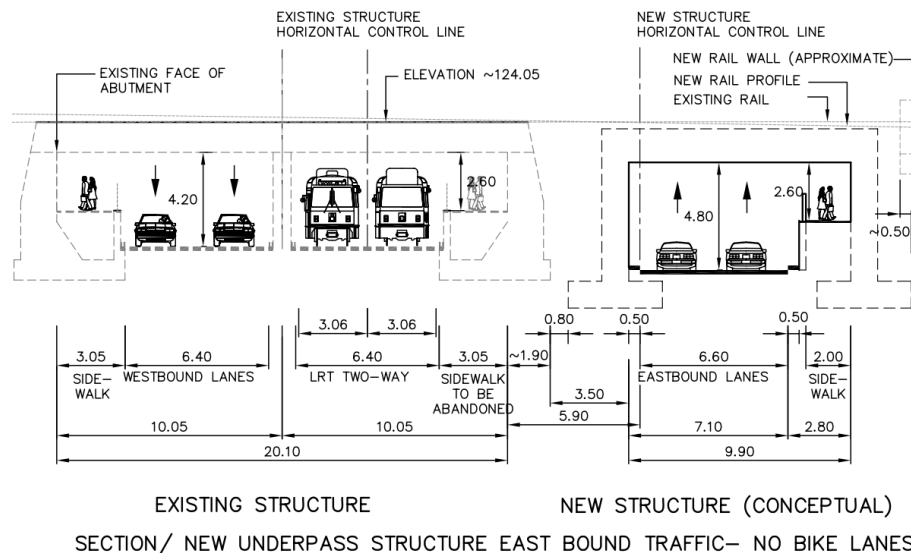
Option 1(B)(i) - Cross-Section at Existing and New Underpass Structure
